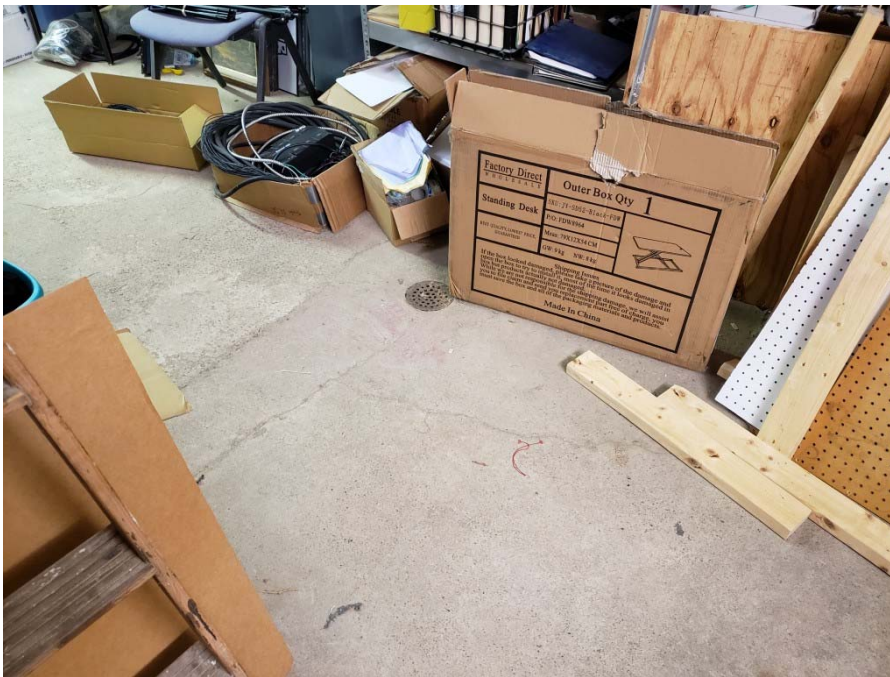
Floor drain in Jim's basement near stairwell (4/2/20; 13:01).
